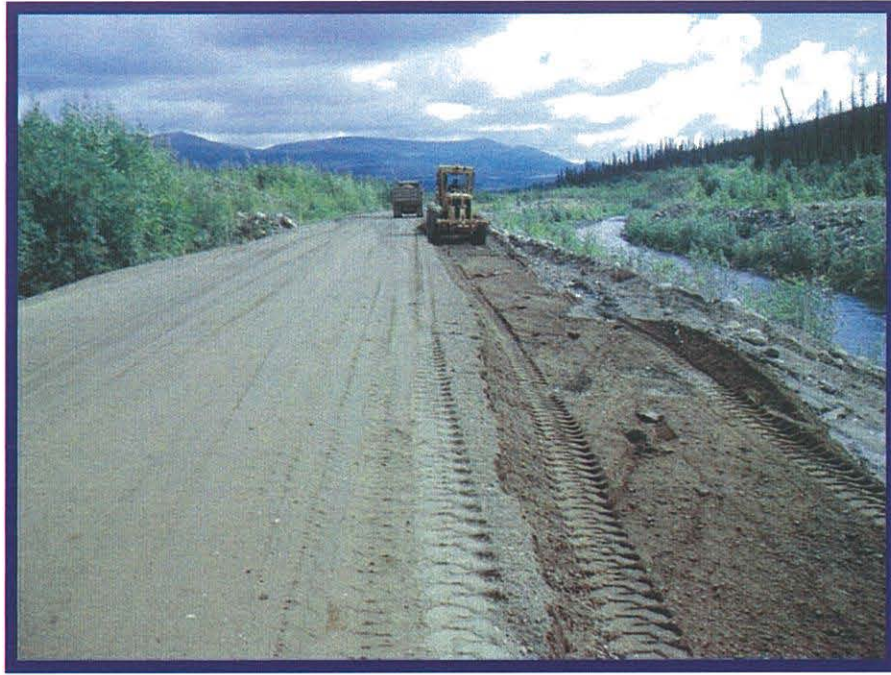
shows a view looking to the west from station 0+725. This shows the area from the previous photo and the start of fill placement in this area.
